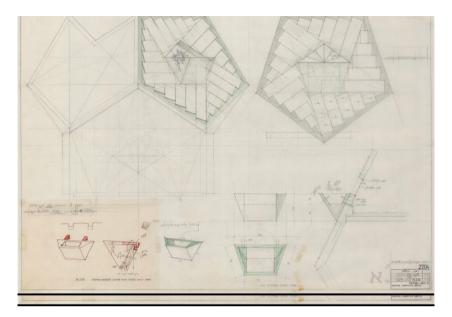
Zvi Hecker, Ramot Polin, Jerusalem: Plan of stone arrangement on building slabs, 15/2/1978. Source: Zvi Hecker Archive, National Library of Israel.
